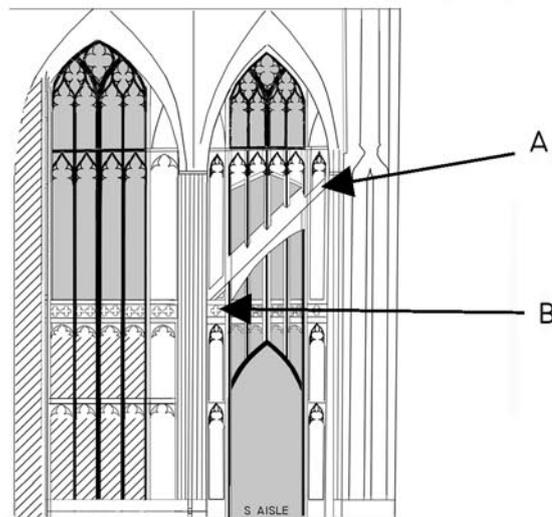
GLOUCESTER CATHEDRAL SOUTH TRANSEPT ~ WEST ELEVATION, INTERIOR
